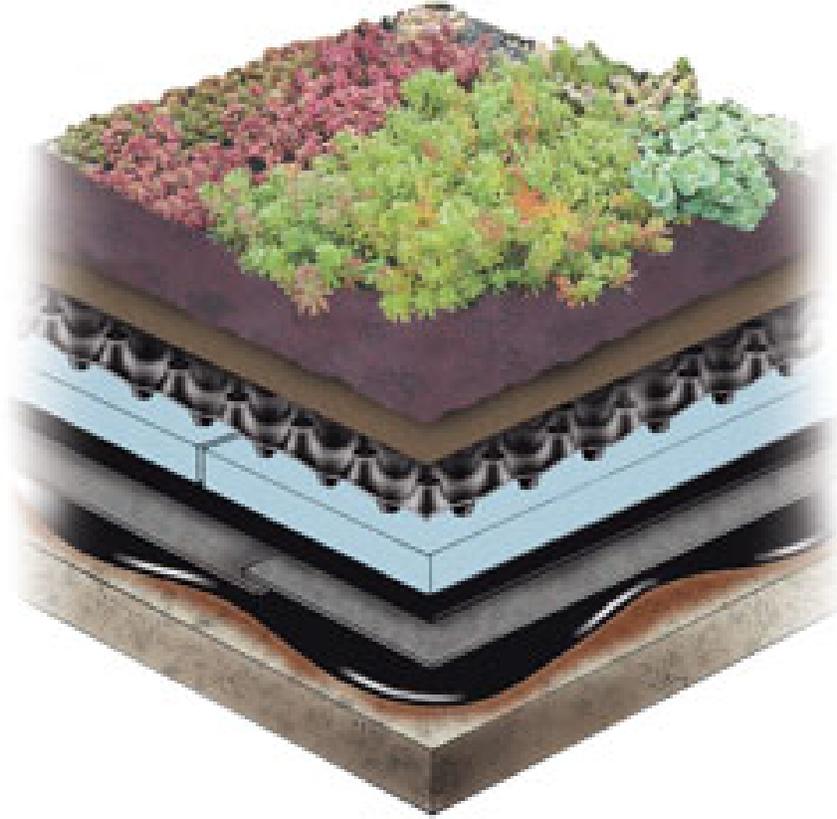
Extensive green roof.(American Hydrotech, Inc.)
